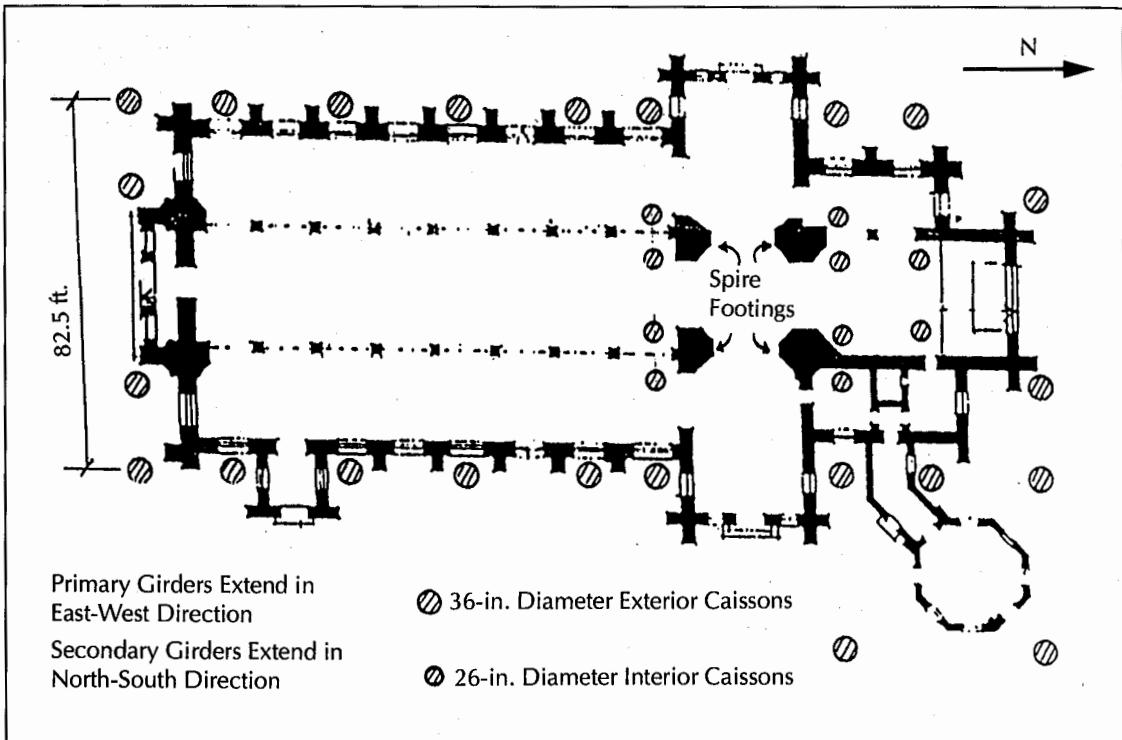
Plan view of the existing cathedral foundations and location of new support caissons.
